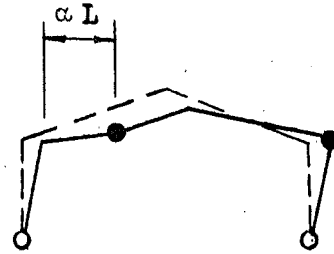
FRAME DIMENSIONS AND LOADING
